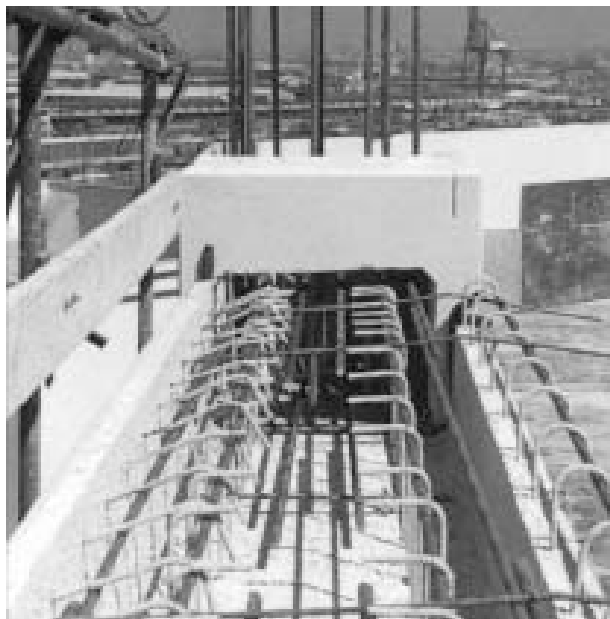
Precast permanent formwork used for an edge-beam of a multi-storey building
